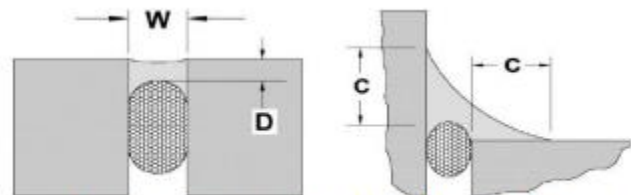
Non-structural sealant bead width and depth recommendations and appropriate joint design
